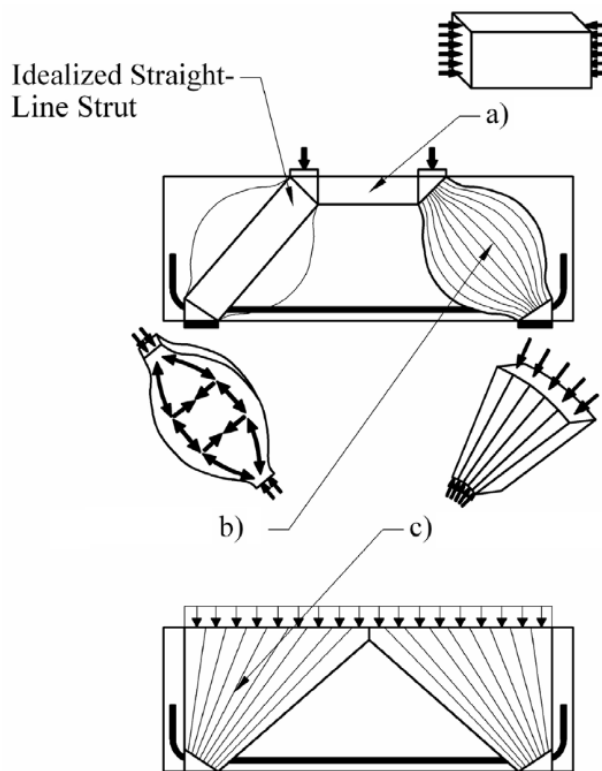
Types of Struts a) Prismatic strut b) Bottle-shaped strut c) Fan-shaped strut
